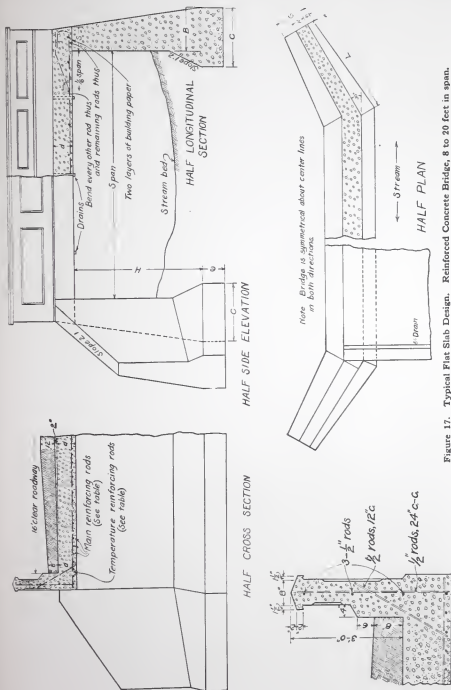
Typical Flat Slab Design. Reinforced Concrete Bridge, 8 to 20 feet in span.
